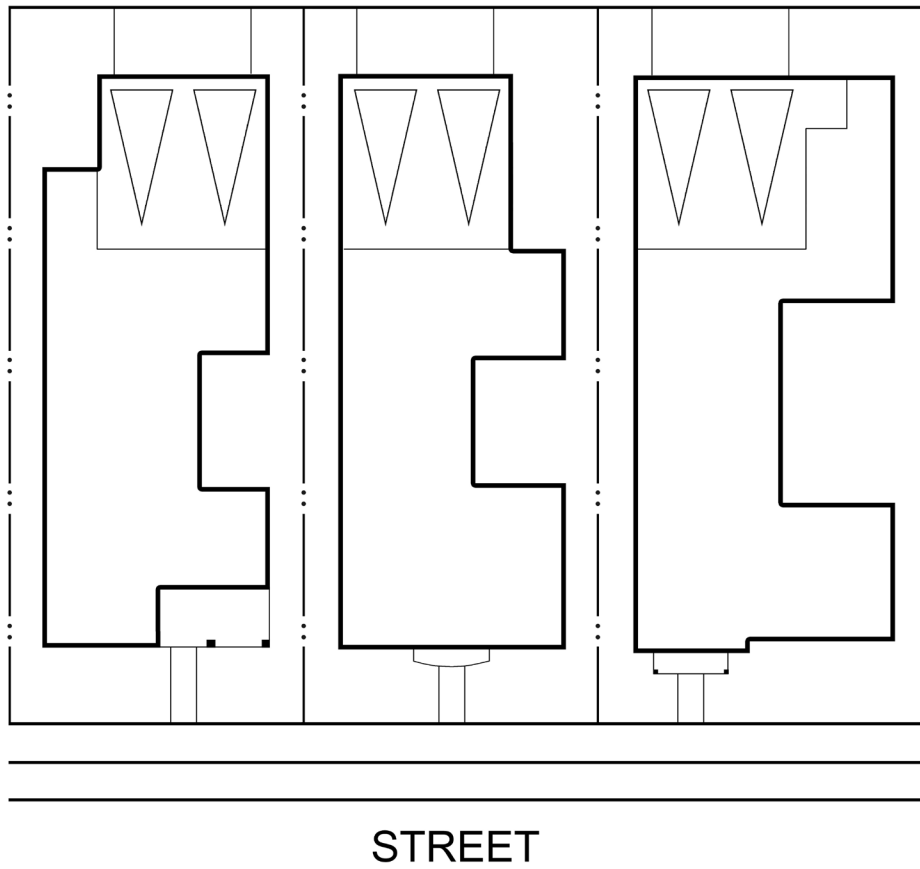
Conceptual Building Type D - Single-Family Detached Alley Loaded
